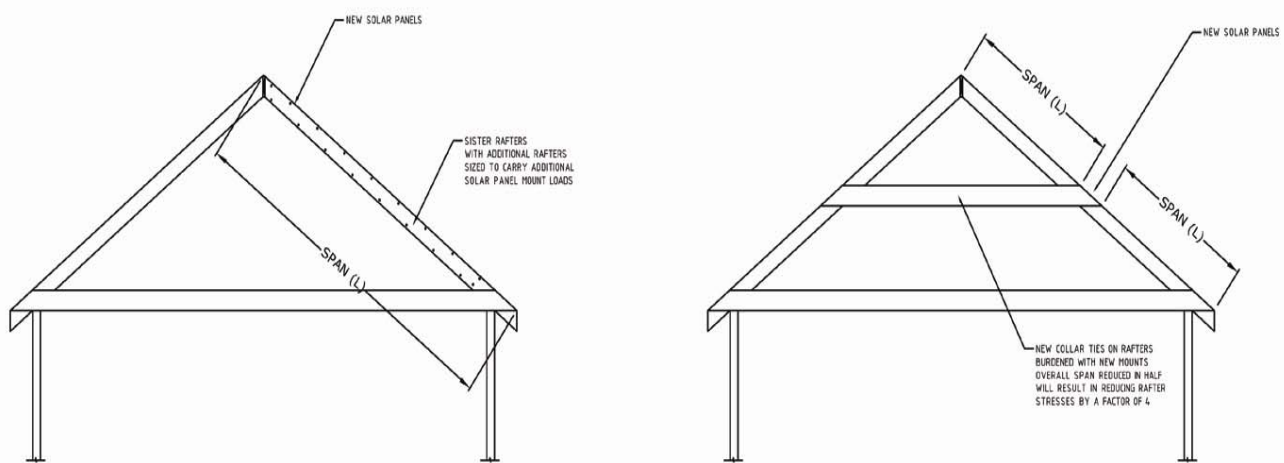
Pitched, Wood Framed Roof Reinforcement
